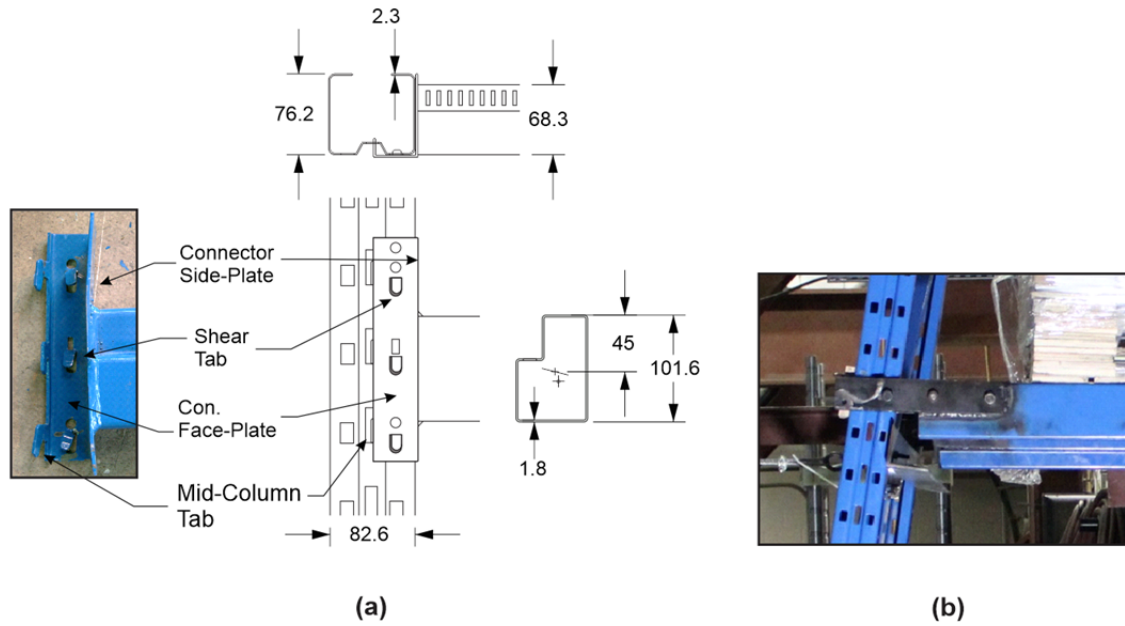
Beam-column connection (all dimensions in mm): a) Photo (taken after testing) and figure of the beam-column connection and section of the column and beam; b) Modified “pinned” beam-column connection in Test F1.
